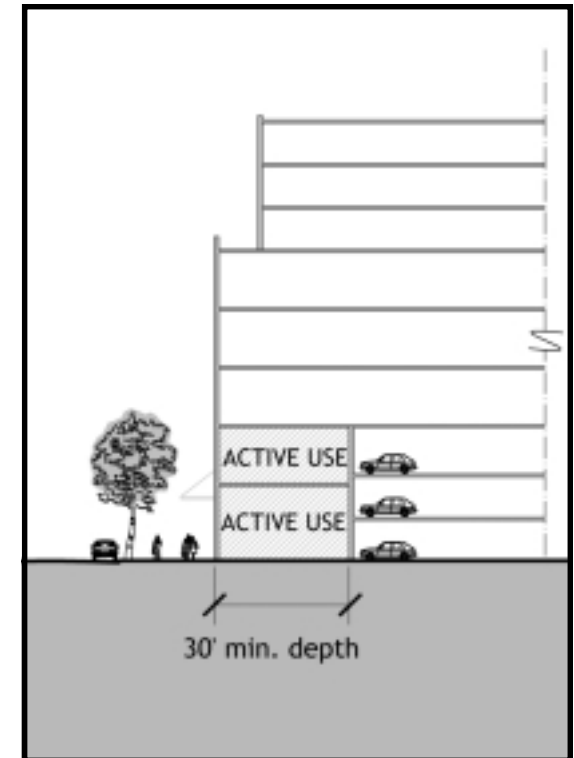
Section showing active use on street frontage; parking garage is not visible from the street
